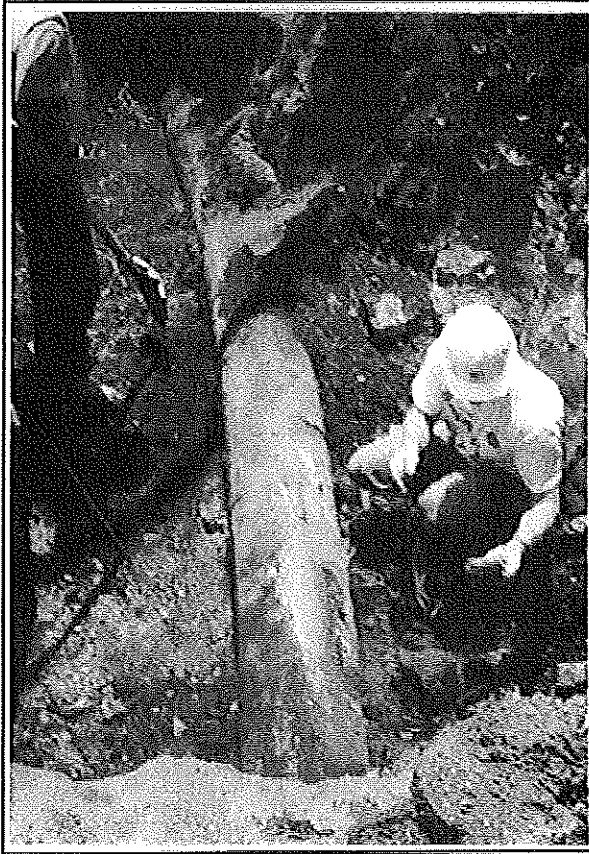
(left). DFM-3 pipe while being excavated. Note bend in pipe necessary to transit down embankment.
